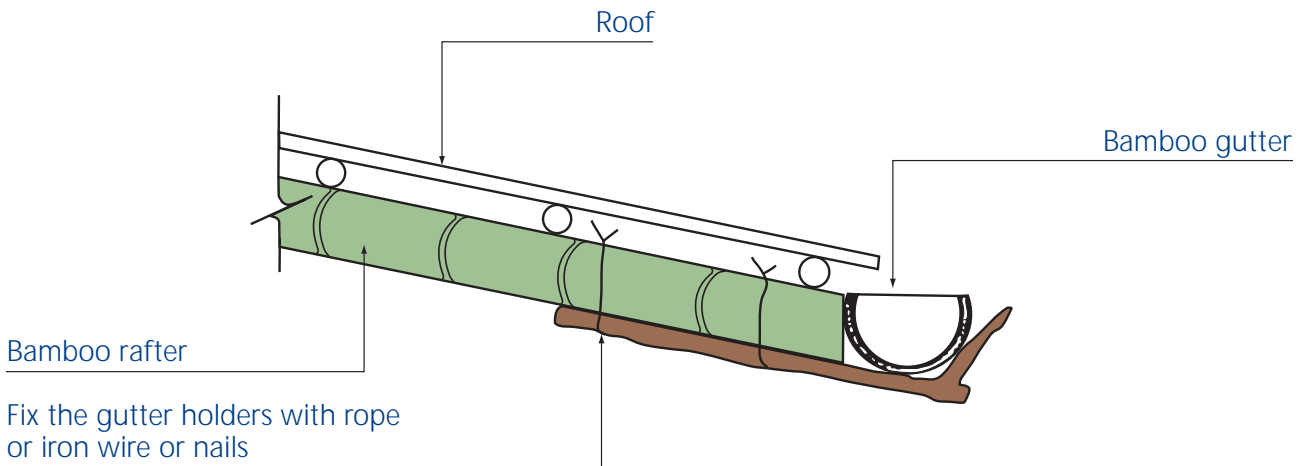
Fix the tree twig gutter holders to the roof structure.
